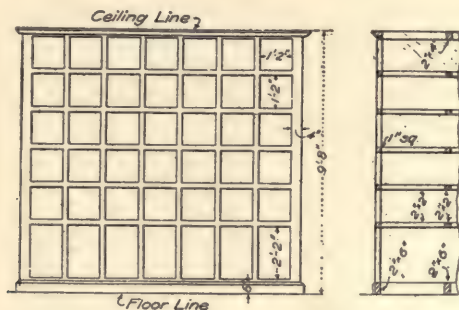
Economical Method of Storing Moldings in Racks or Bins.
